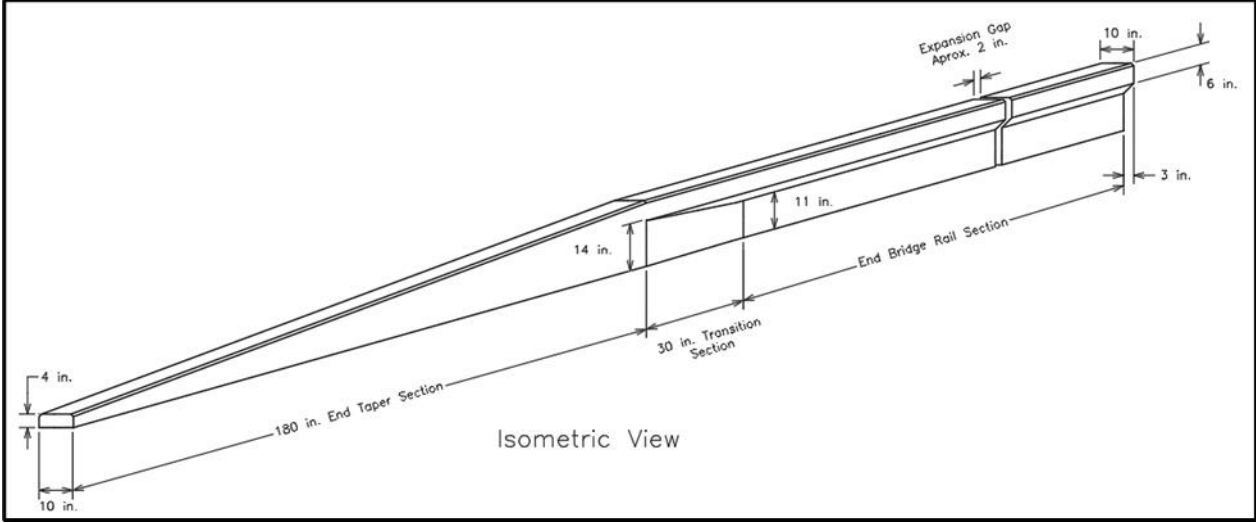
USDA-FS-NTDP Modified Bridge Railing with Sloped Concrete End Treatment
